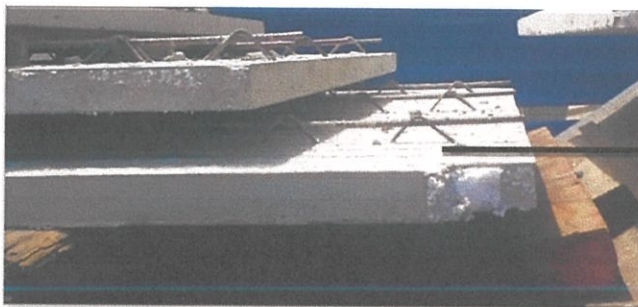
Half slab precast concrete were install by a crane, Bukit Kepong
